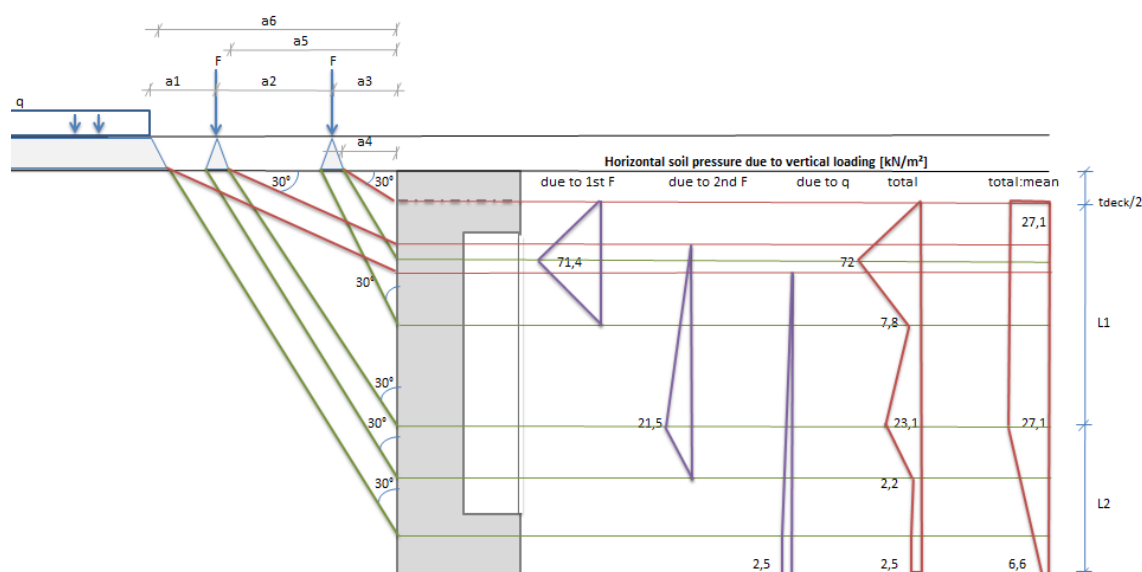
Horizontal loading on the ground retaining wall due to vertical LM71
